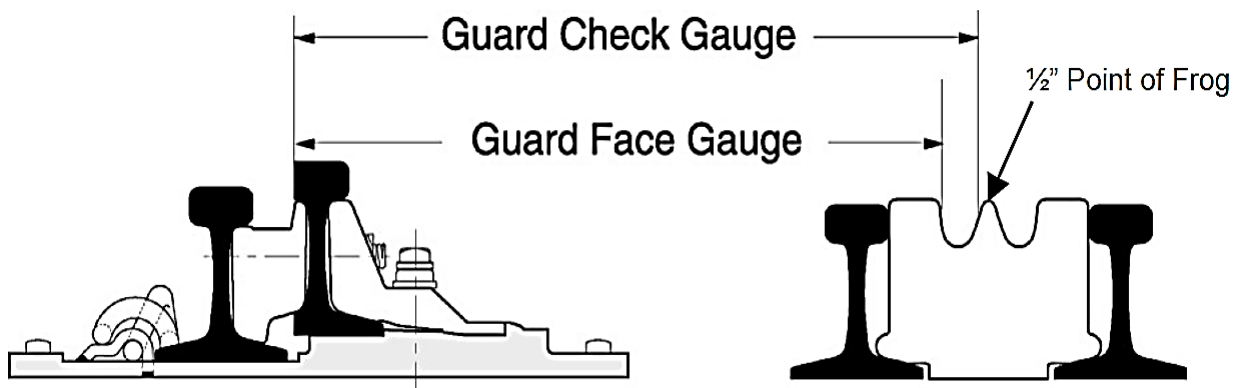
Figure SUB-PART D – 80 – Guard Check Gauge and Guard Face Gauge Measurement Locations
